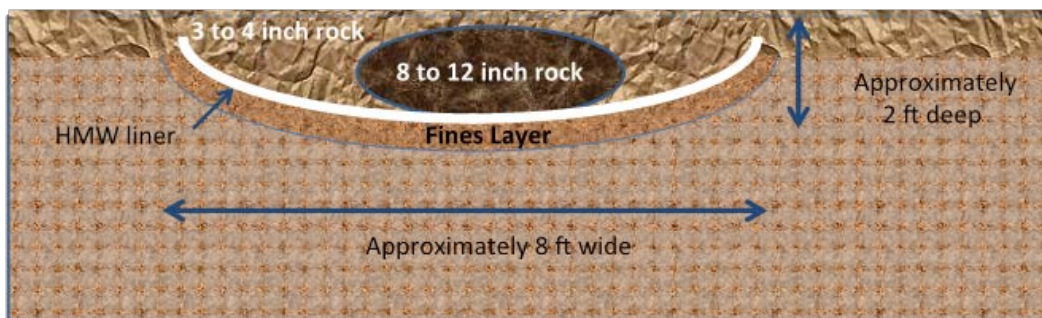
Upslope drainage ditches along the Land Transition of the SBT.
